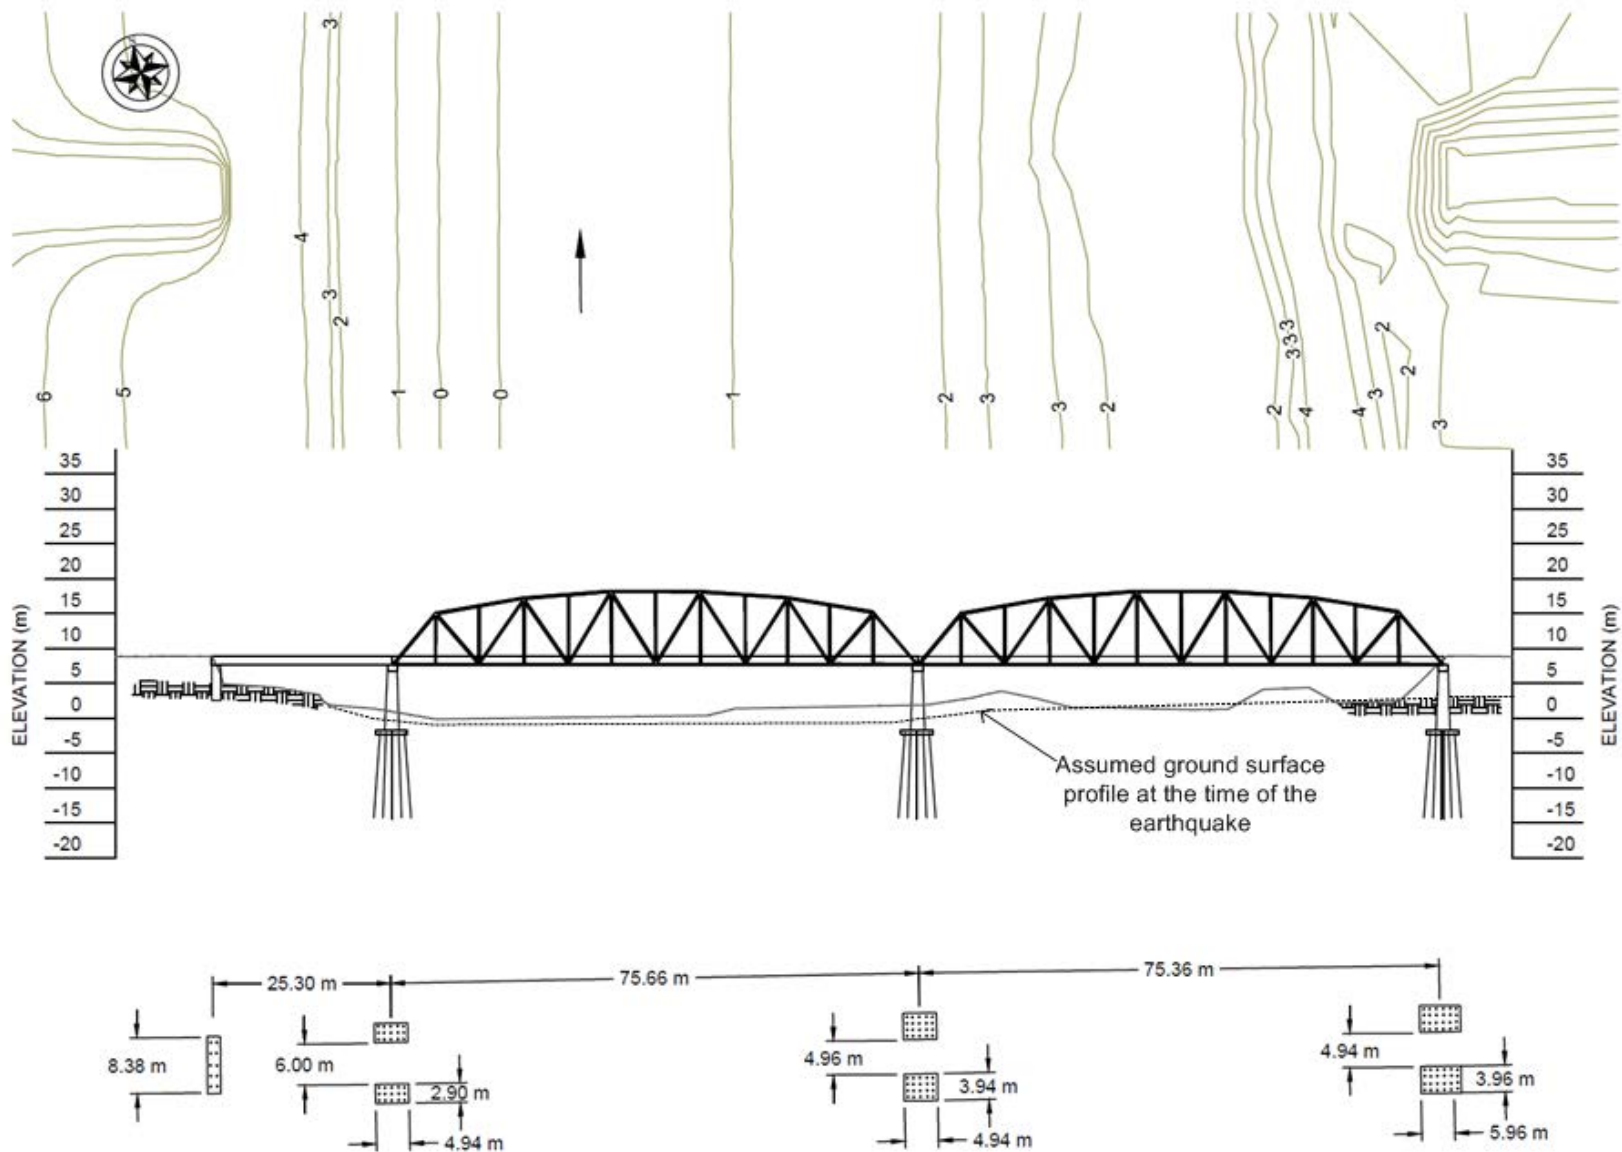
Simplified sketch of the plan and profile views of the Rio Estrella Bridge
